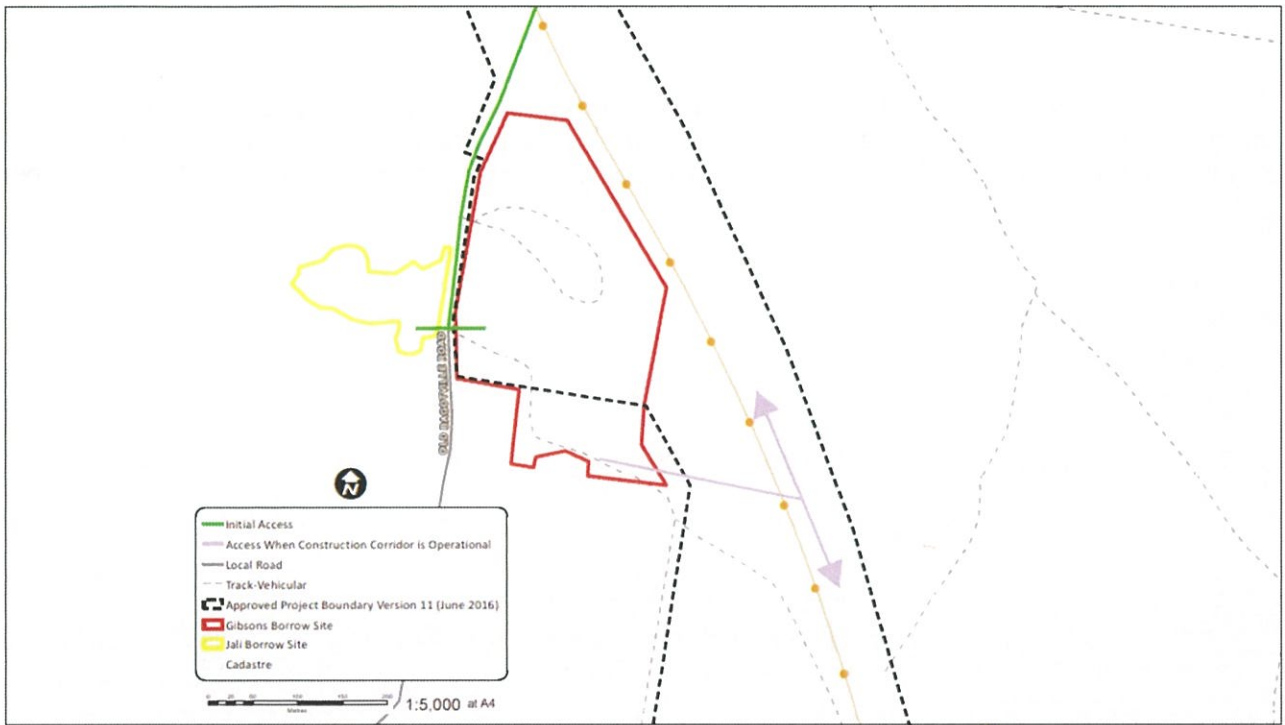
The locations of proposed Gibsons and Jali borrow sites, noting planned access points.
